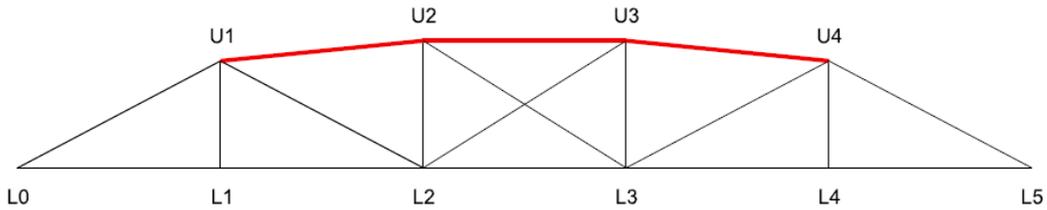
Overstressed Truss Members (Spans 1, 5, and 6) – Rehabilitation with Widening
